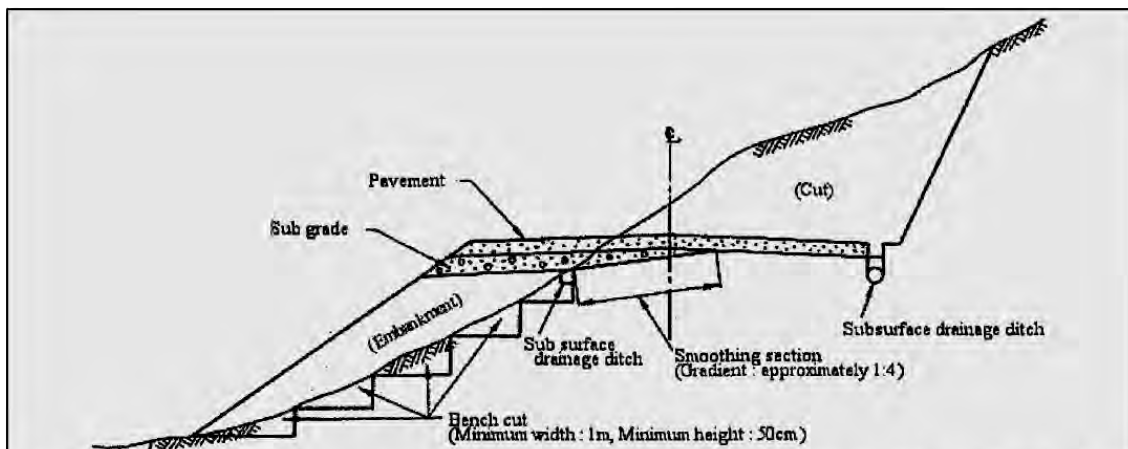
Bench Cutting of Foundation Ground for Embankment and Connecting Section Between Cut Slope and Embankment (Example of Sandy Ground)
